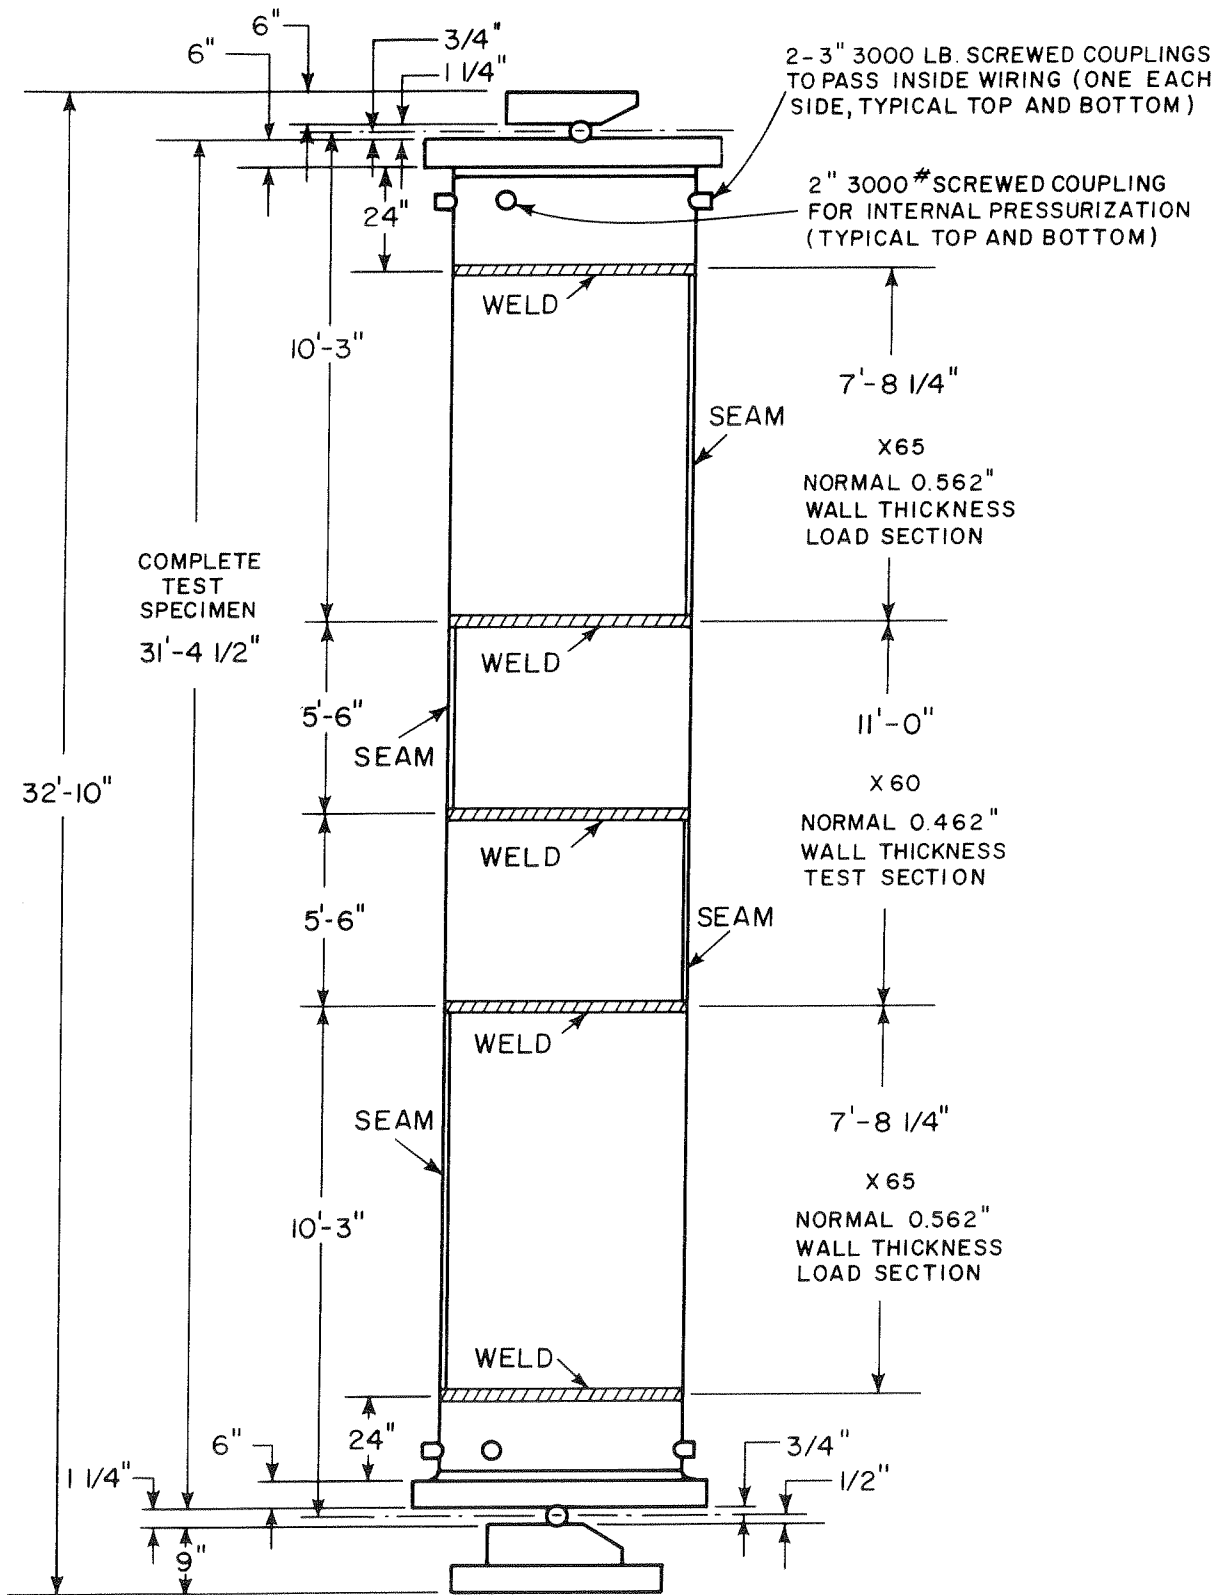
TYPICAL 48" PIPE TEST SPECIMEN
